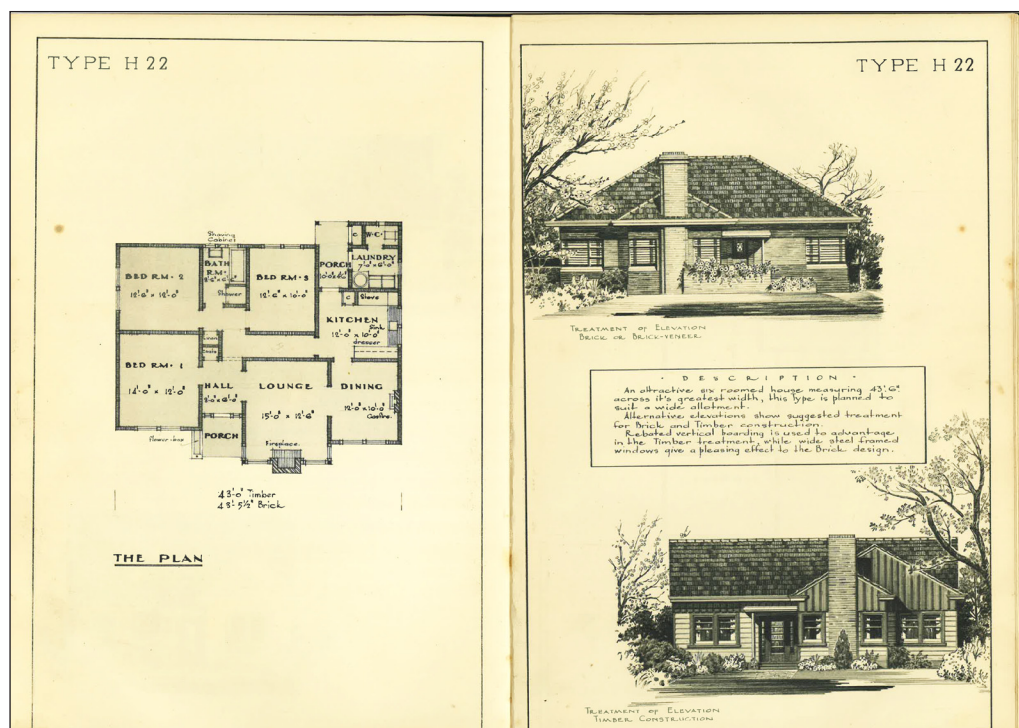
Type H-22 in plan and elevations in both brick/brick veneer (top) and timber (bottom) construction, from 1941. *Design Book: Housing Loan Conditions*, The State Savings Bank of Victoria, 1941. Source: The authors.
